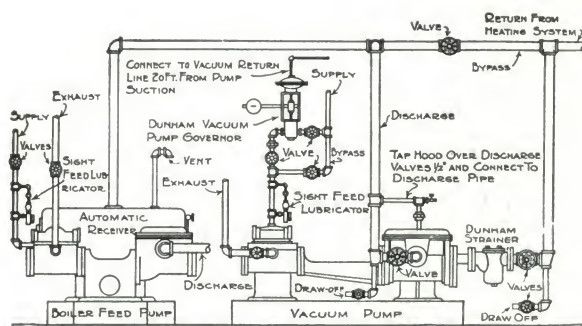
A. Showing Connections to Steam Operated Vacuum Pump, Boiler Feed Pump with Automatic Receiver
